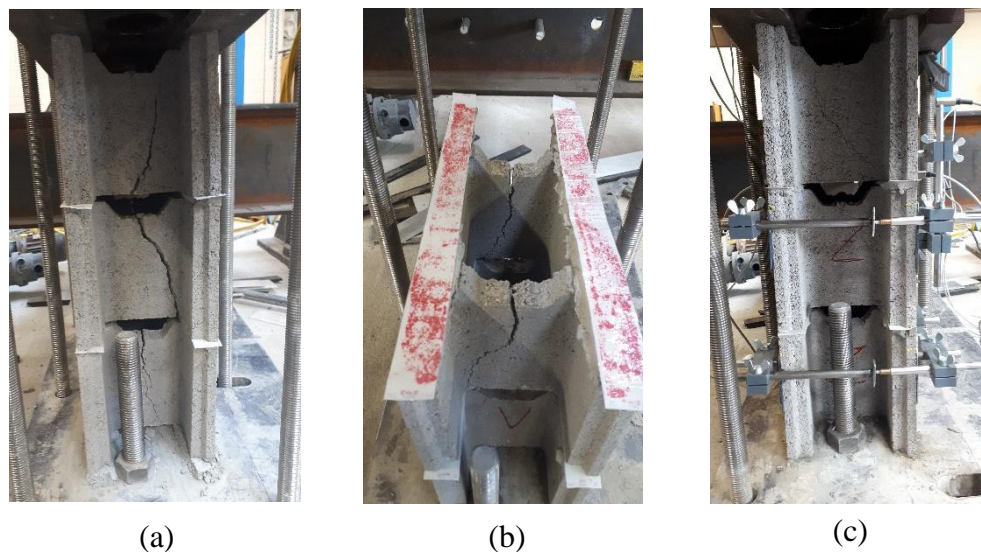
Failure mode in the masonry prisms of P-group 1 to 4. (a)-(c) cracks in the webs;
